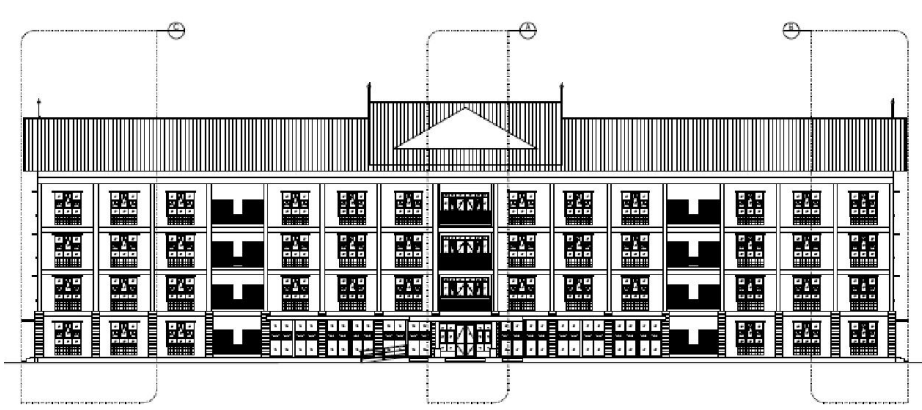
BIM Application in Precast Concrete Detailer in Low Cost Housing of Ministry of Public Works 1
